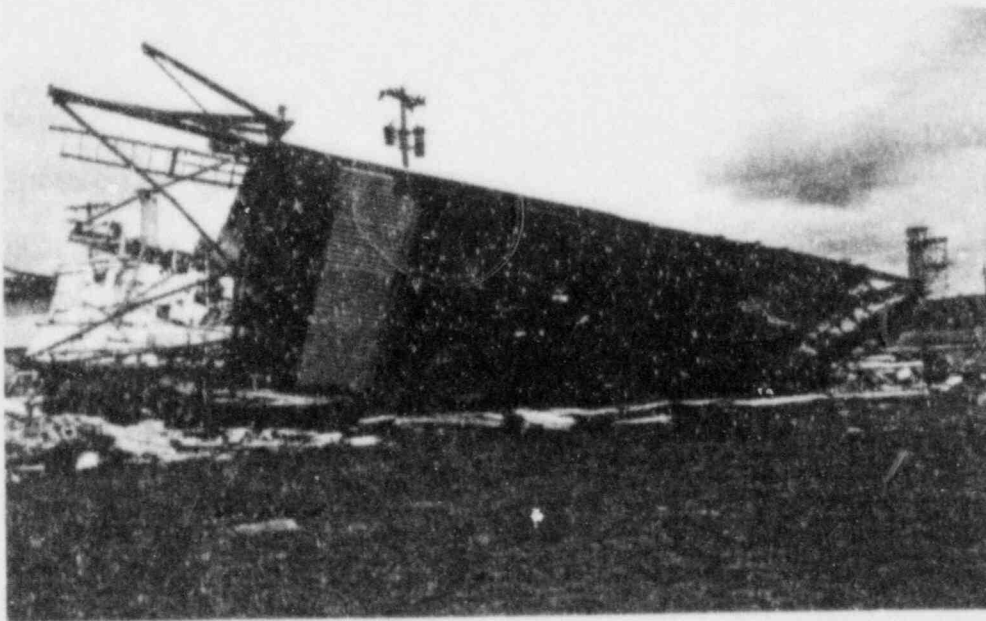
OVERTURNED PARACHUTE DRYING TOWER (failure initiated when anchor bolts in two of the corner columns failed in tension)
